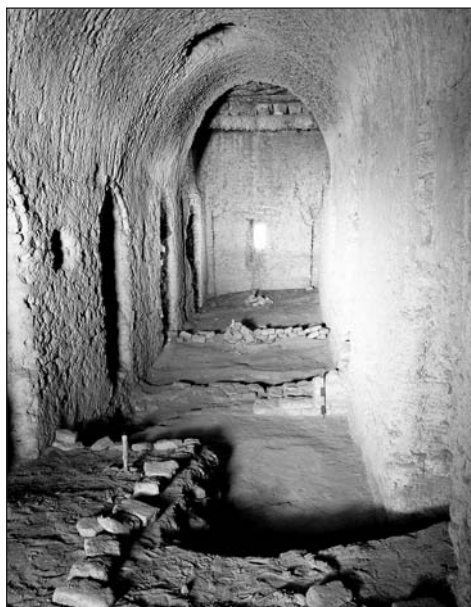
Mosque, room 3 after rebuilding of the ground floor in 1974
